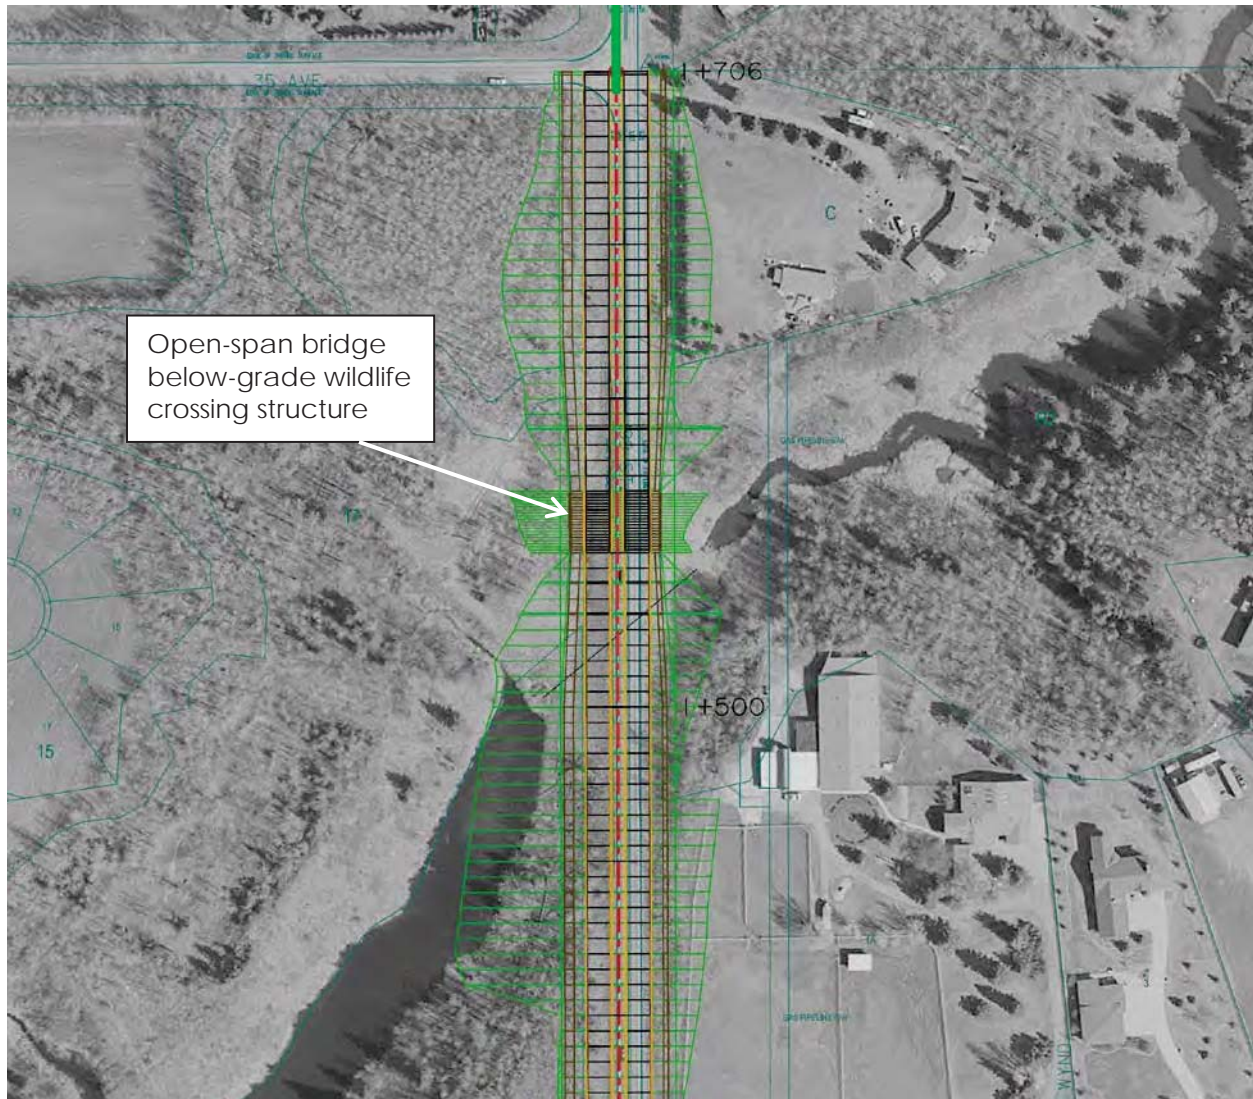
Proposed Location of the Open-Span Wildlife Crossing Structure at Wedgewood Creek
